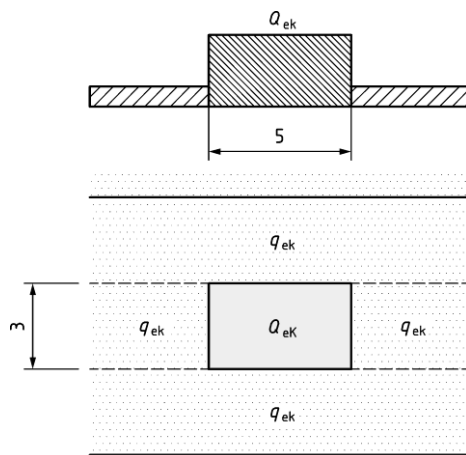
(CYS) — Road traffic load model for geotechnical structures
